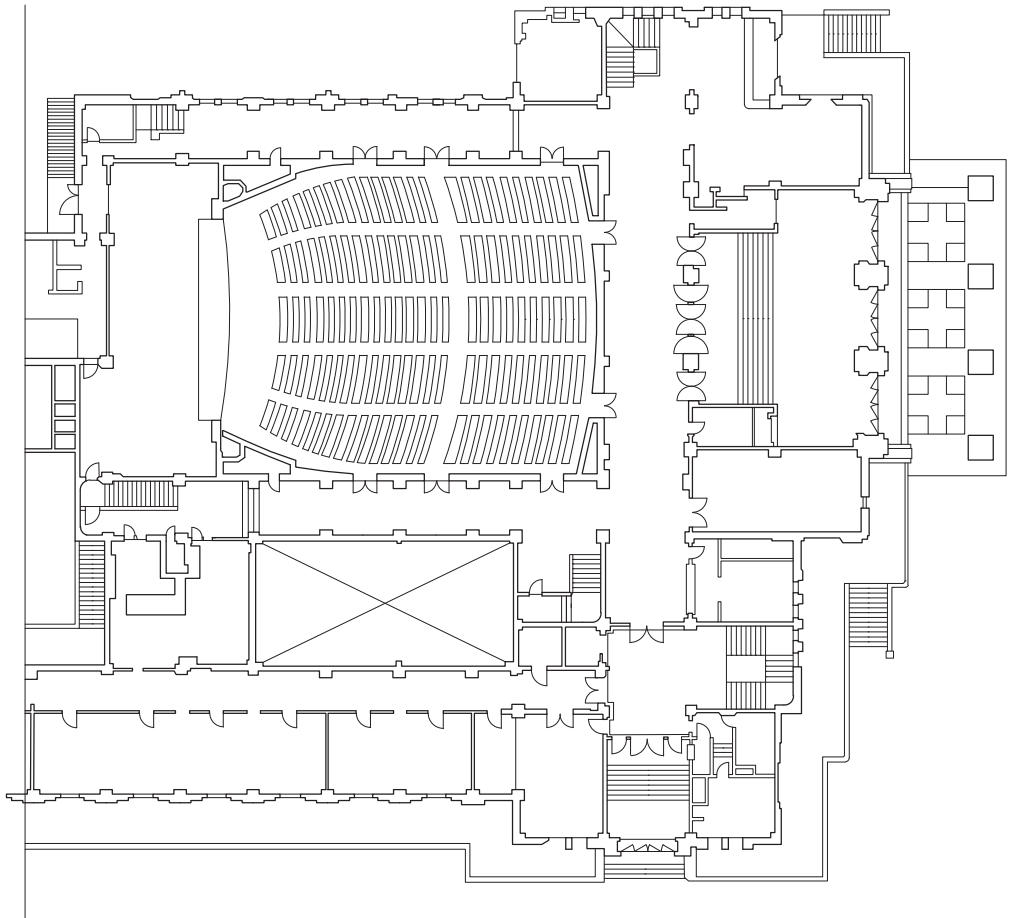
Floor plan of the Gunjin Kaikan, Scale = 1:700.
